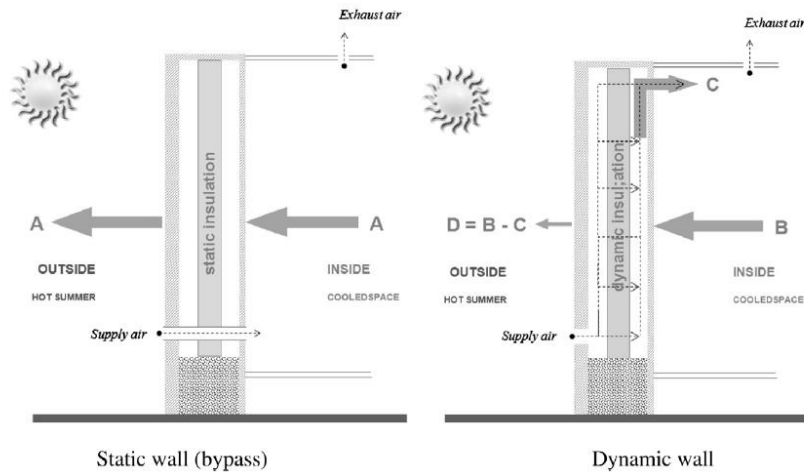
Wall construction schemes (Source: El-Sarrag, and Al-Horr , 2012)
